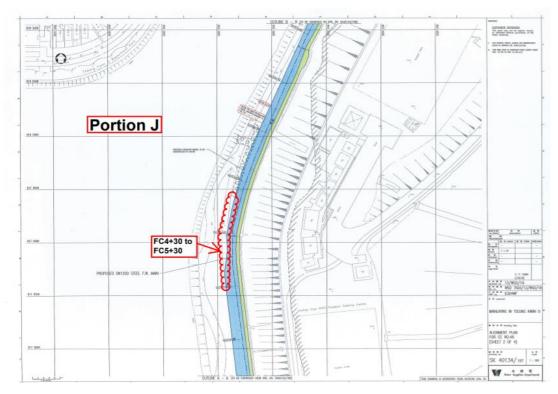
Location Plan - Landfill Stage 1 (Area FC4+30 -FC5+30)
